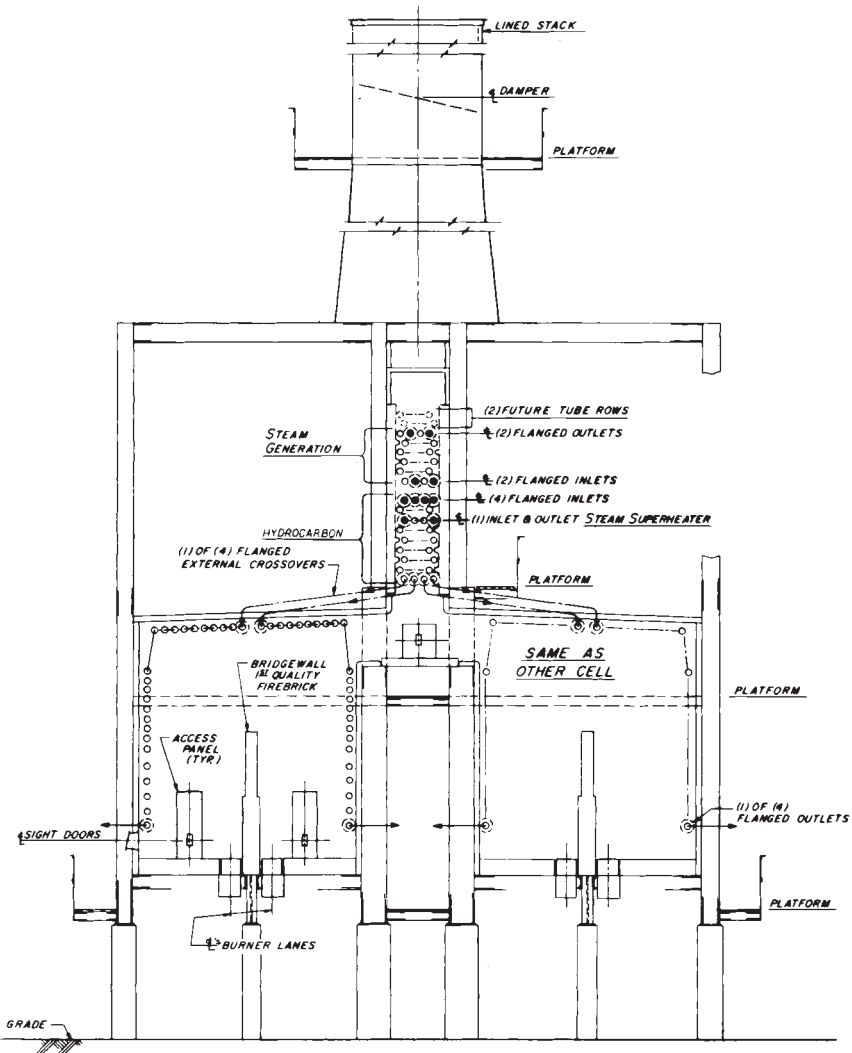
Typical coker heater: sectional end elevation.
